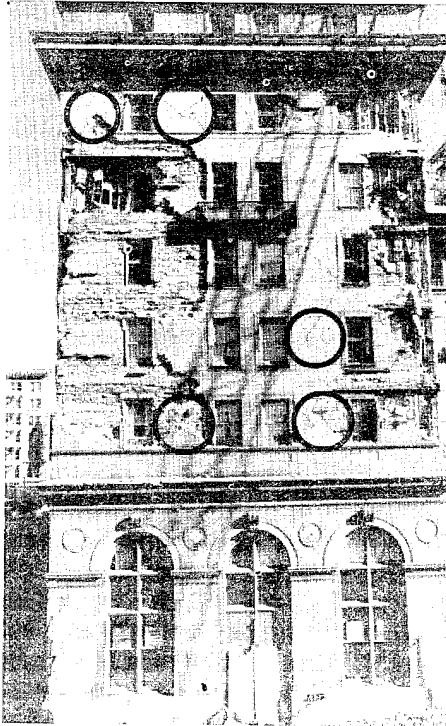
Damage to southwest facade after removal of loose brick
